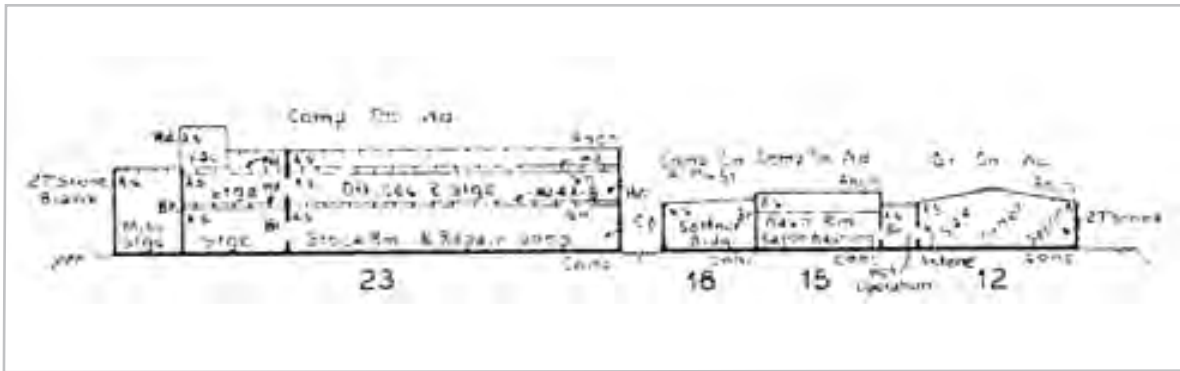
Factory Mutual Insurance Co. *Mill Realty Co.* 1965. South-north cross-section through Buildings 23, 16, 15 and 12. Scale: 1 inch= 30 feet (approximately).
